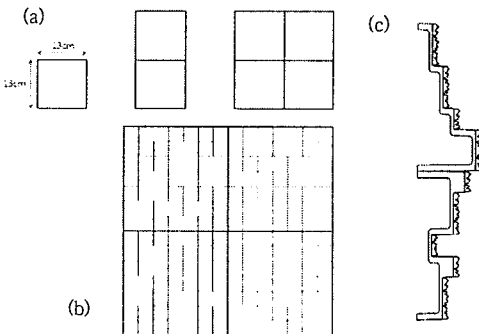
Diffuser profile. (a) module, (b) plan and (c) section
